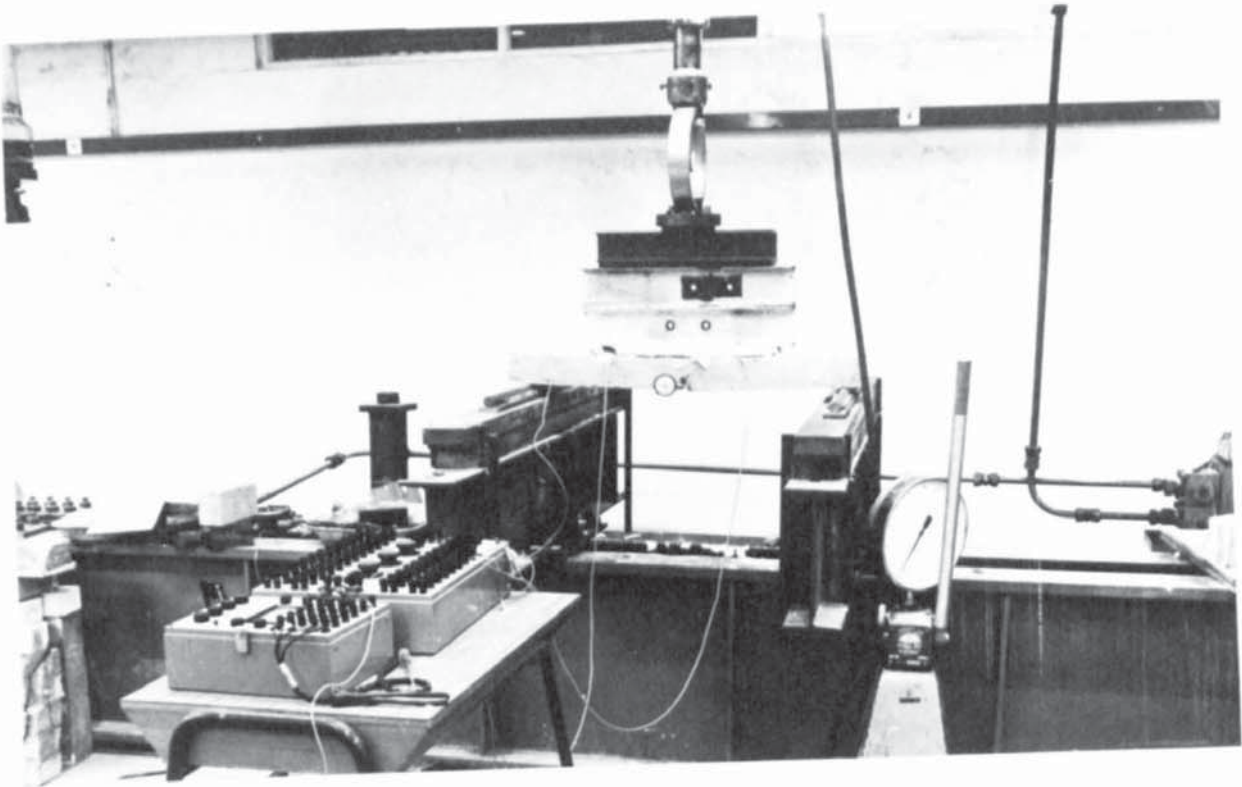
TEST SET UP (MONO - BAR CONCRETE STRIP)
